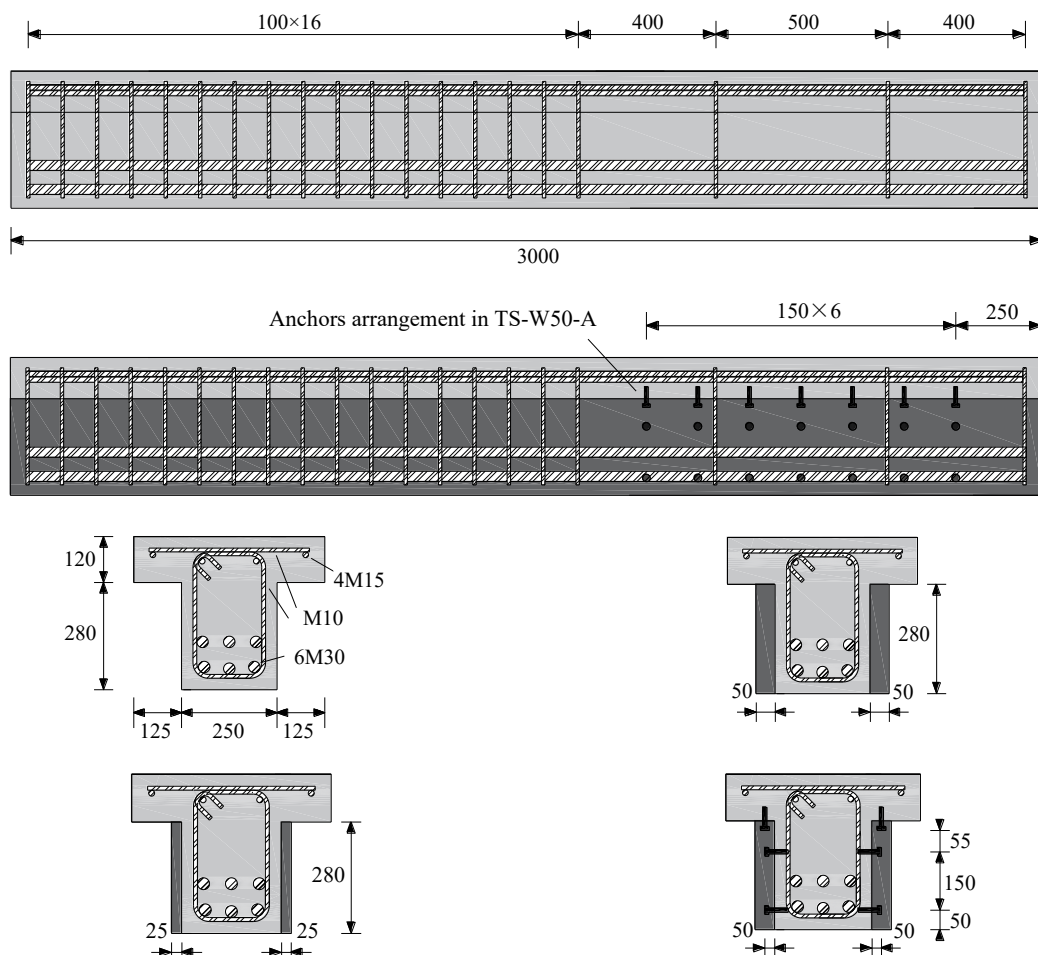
Configuration of the four concrete T-beams tested: a) Lateral view of TS-R beam; b) lateral view of TS-W50-A beam; c) cross-section of TS-R beam; d) cross-section of TS-W50 beam; e) cross-section of TS-W25 beam; f) cross-section of TS-W50-A beam
